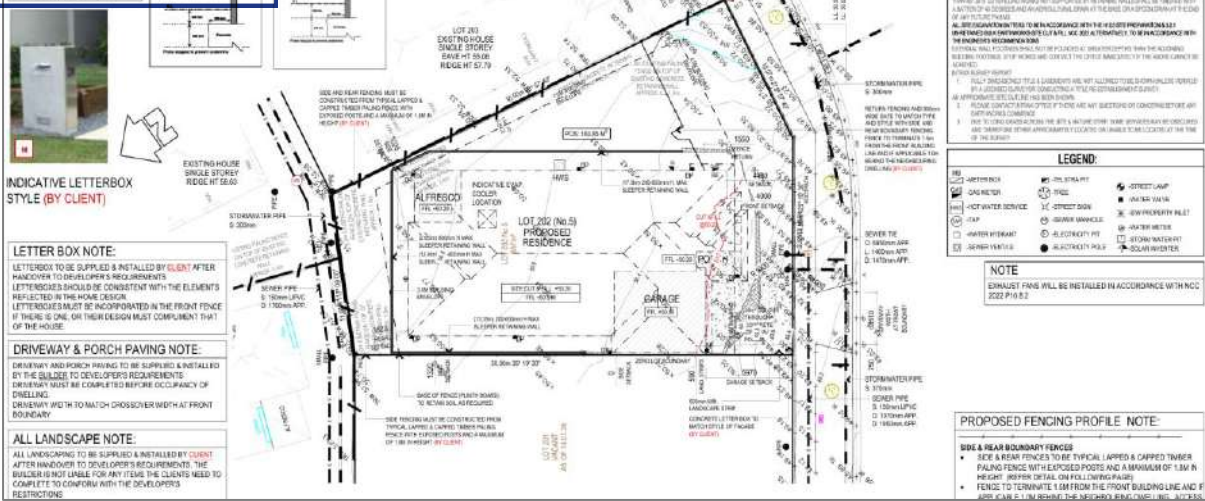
Site Plan of the Proposed Dwelling Site Plan
